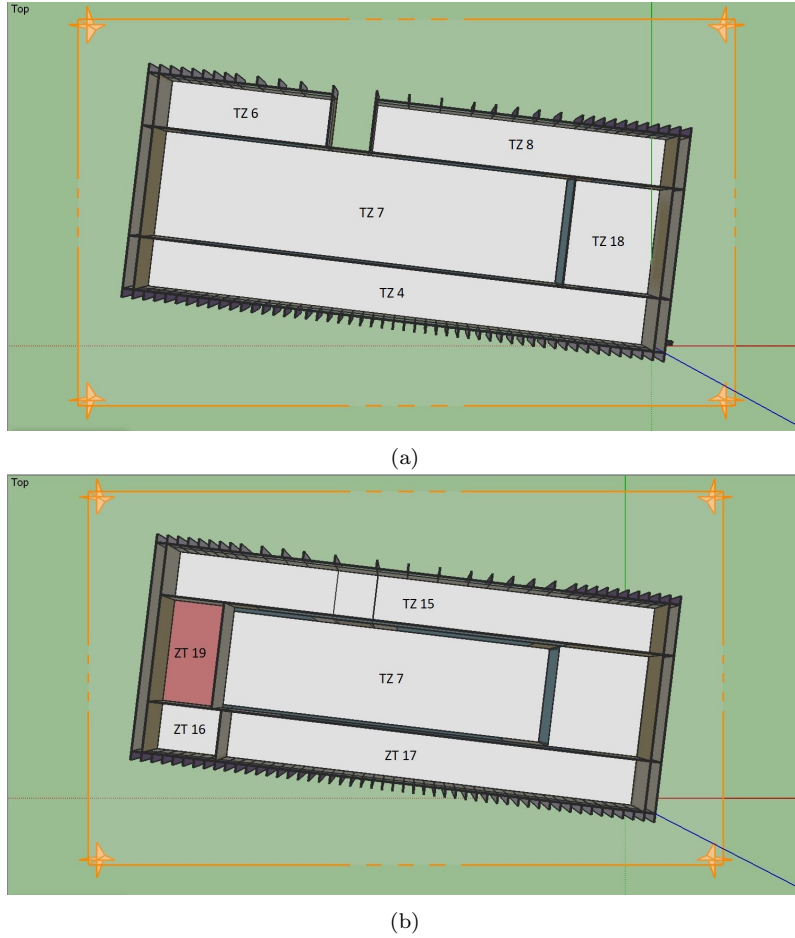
Plan views from SketchUp divided by thermal zones. (a) First level and (b) second level.
